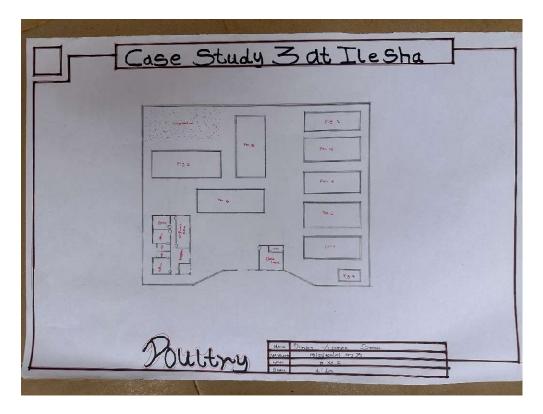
Poultry Farm Layout Plan of case study three
